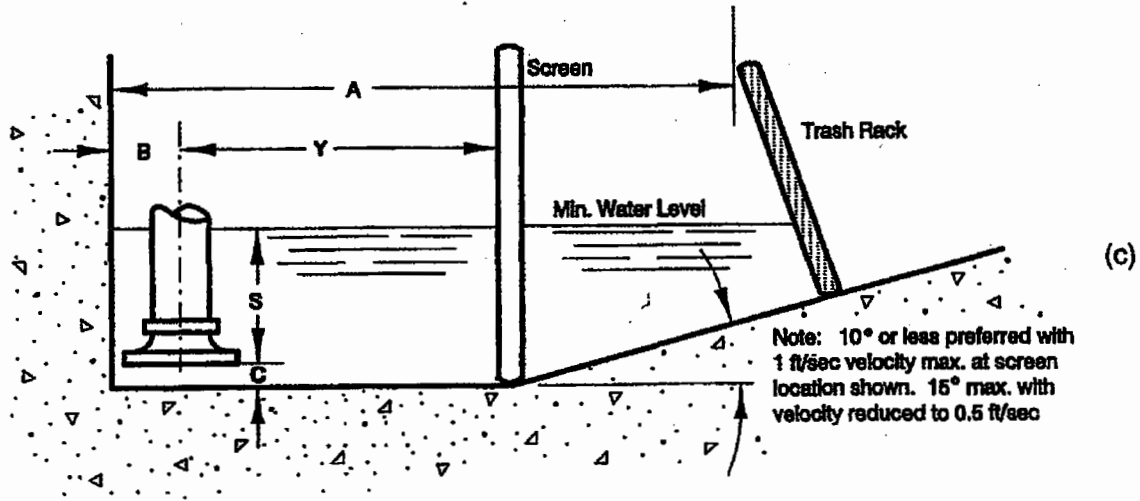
cont'd (c) sump dimensions elevation view using wet well-type pump.
